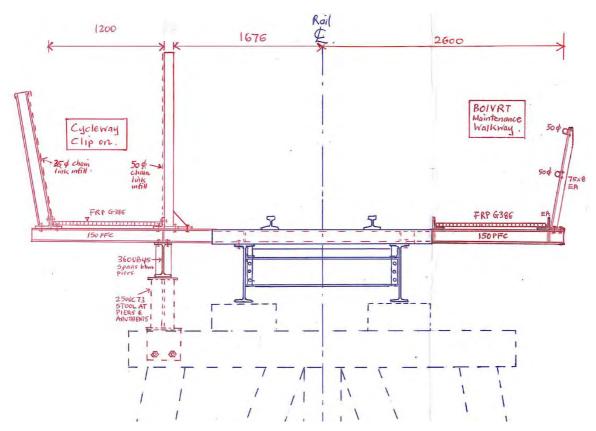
Clip on to Rail Bridge 12 BOIVR Whangae at span 1. Span 4 similar due to mass concrete piers.
